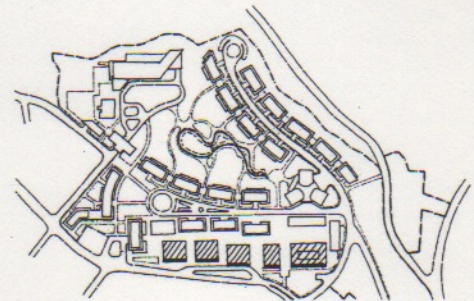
Erratic and fragmented retail frontage on Old Damascus Road.
